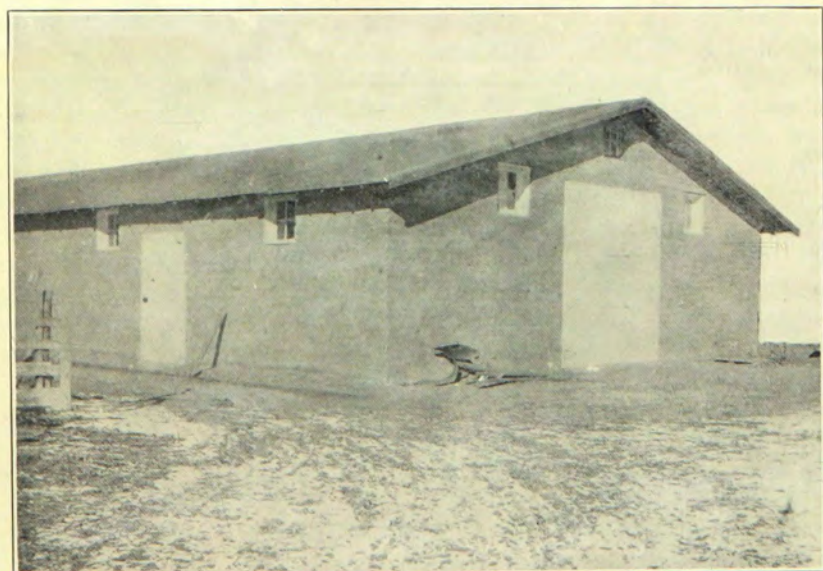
Adobe house used for storage of onions. The outside of this house has not been covered with cement.
